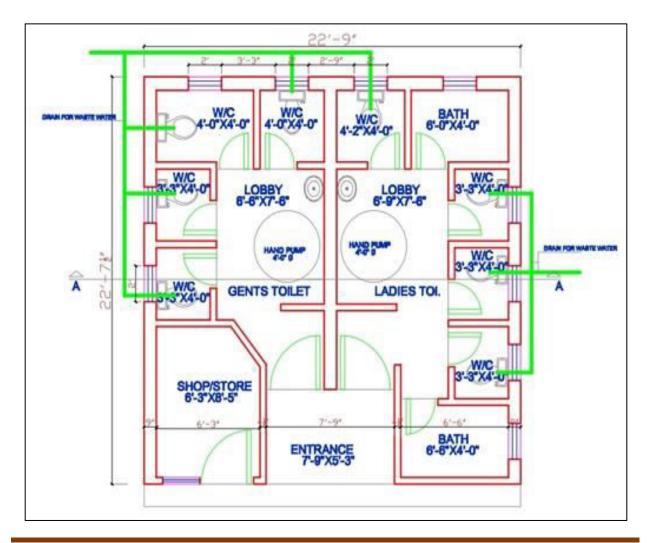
APlan and Section Of Public Sanitary Complexes
